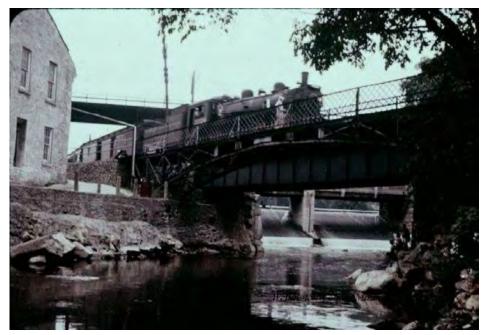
1956 photo of previous footbridge south of the GJR bridge. CHR2 can be seen at the left of the picture, and Allan's Dam, the Metrolinx viaduct and GJR bridge can be seen in the background.
